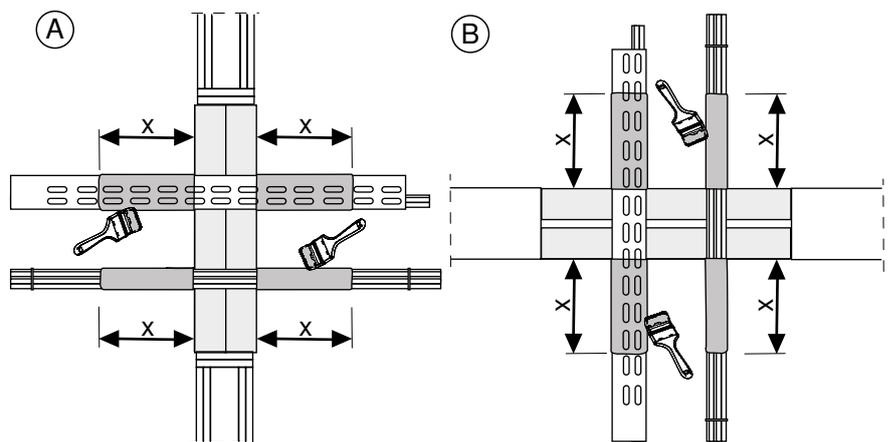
Ablation coating on cables in wall (A) and ceiling (B)
